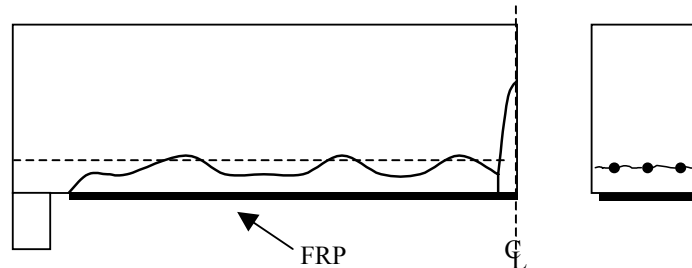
Delamination caused by tension failure of the concrete cover
